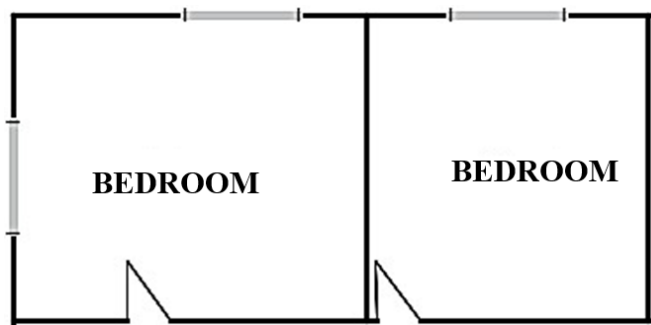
Plan of a starter house (Source: Field observations, 2021)
